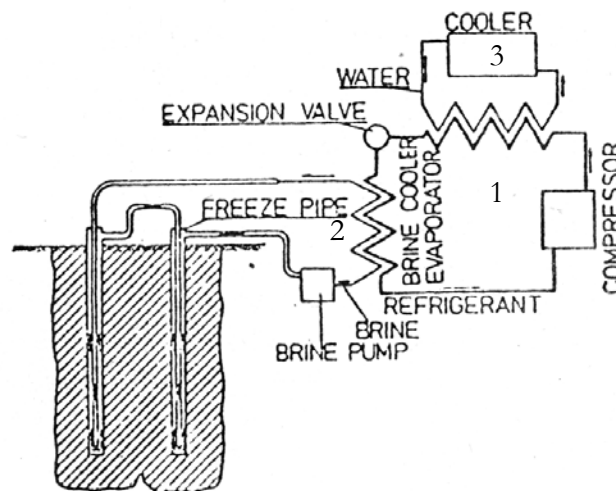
Indirect freezing through “brine freezing”, schematic illustration: 1.) The compressor circuit, consisting of compressor, condenser and evaporator chamber. 2.) Brine cooling circuit consisting of evaporator chamber, brine pump unit and freeze pipes. 3.) Cooling circuit consisting of condenser chamber, cooler and cooling pump. The heat exchange takes place in the condenser and in the evaporator chamber. Modified after Jessberger (1980)
